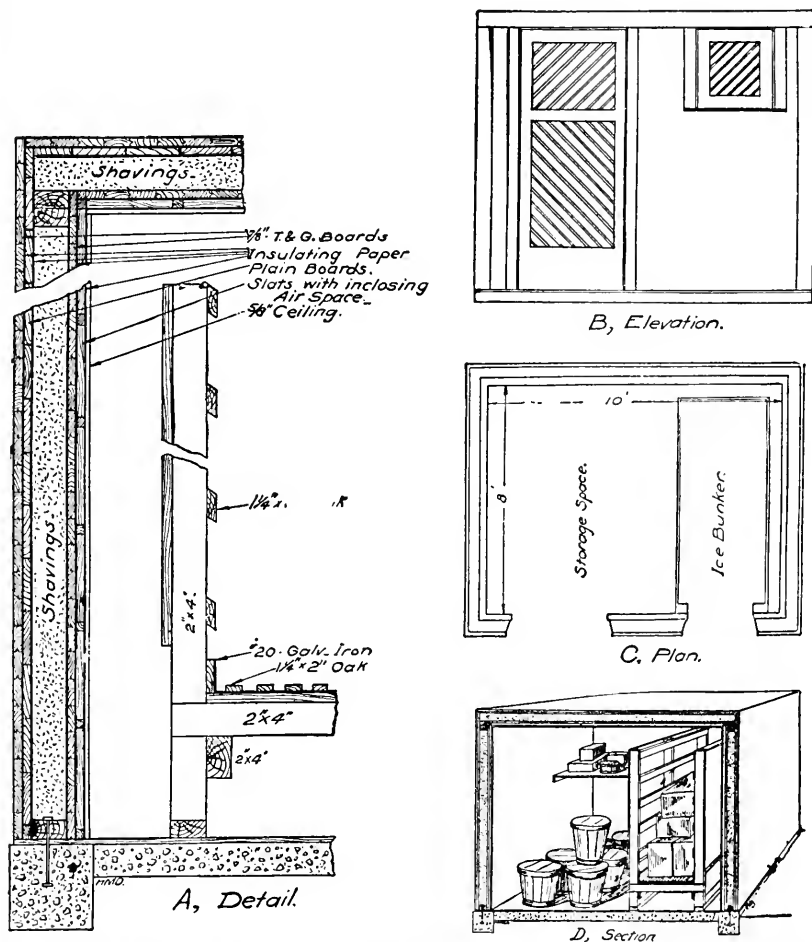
Diagrams showing cross section and details of construction of a farm refrigerator. A, detail of wall construction and ice bunker; B, front elevation; C, floor plan; D, sectional view
